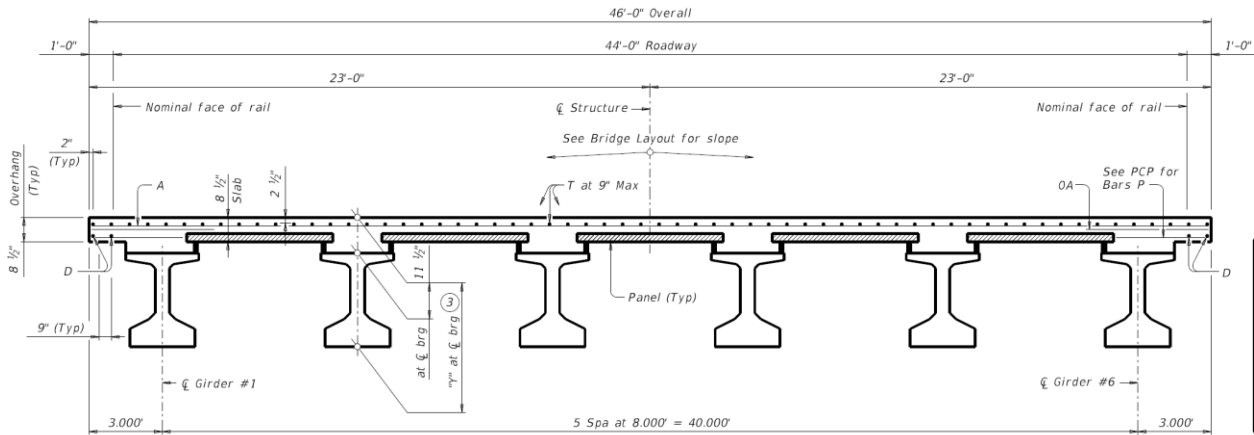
Typical Bridge Cross-Section Using Tx54 Girders (TxDOT 2019).
